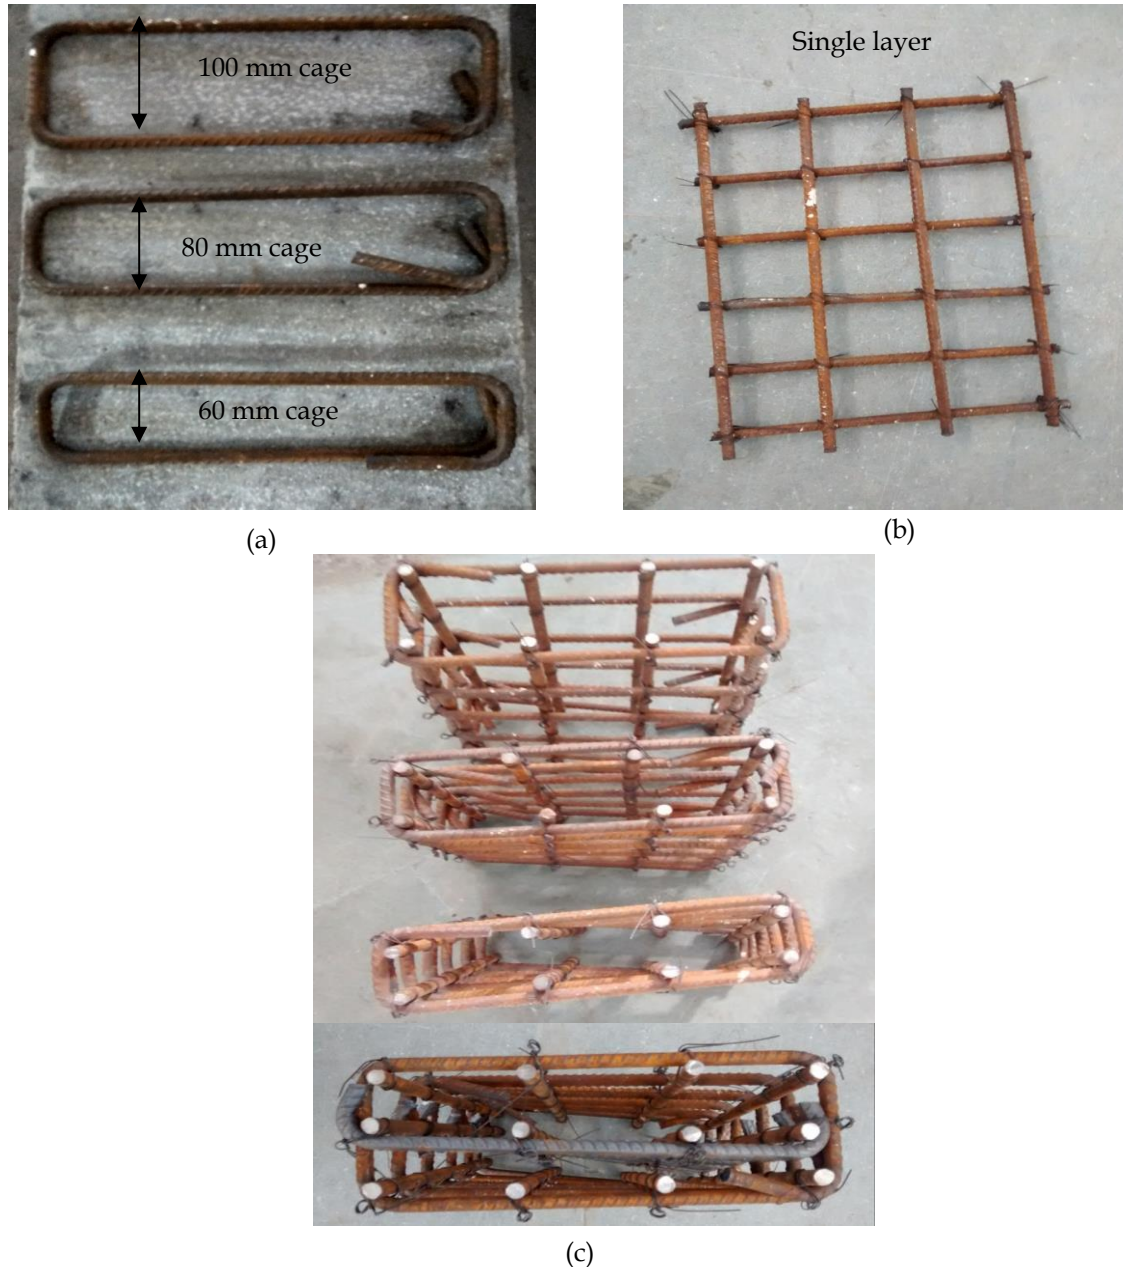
Geometry of reinforcement bars; (a) shear stirrups for 100 mm, 80 mm and 60 mm cages, (b) single layer reinforcement cage and (c) double layer (100 mm, 80 mm and 60 mm cages) and triple layer reinforcement cage
